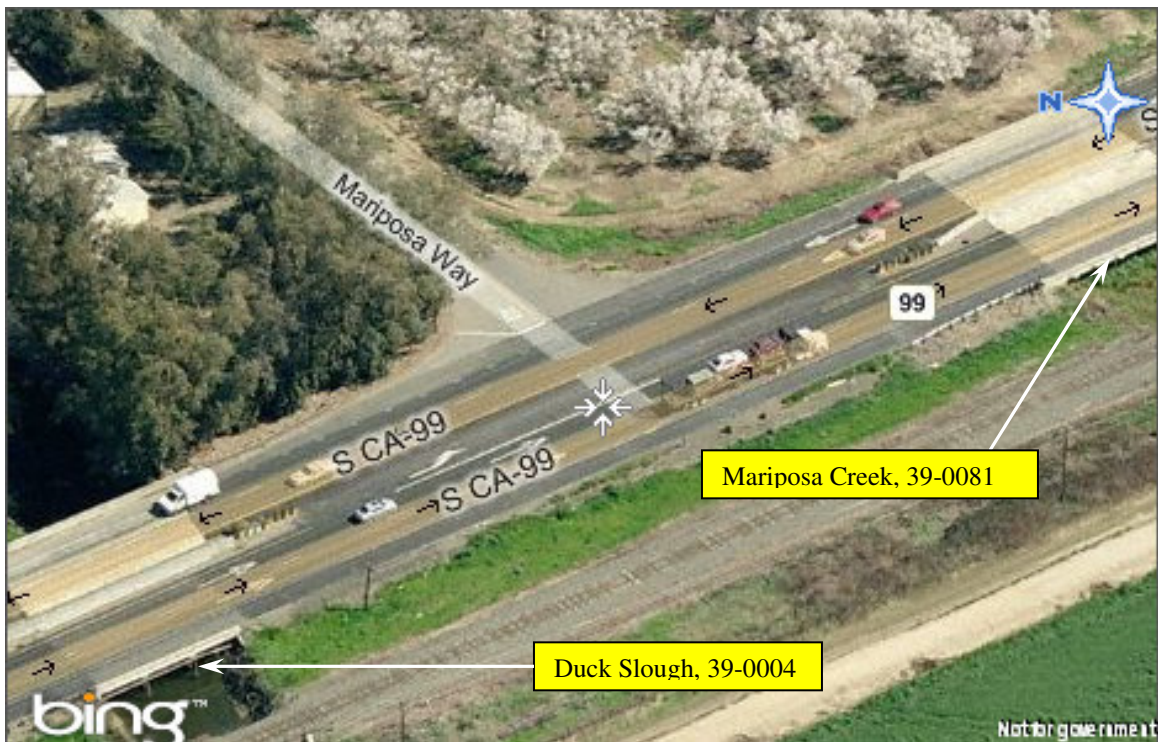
Looking East at the Duck Slough and Mariposa Creek structures.
